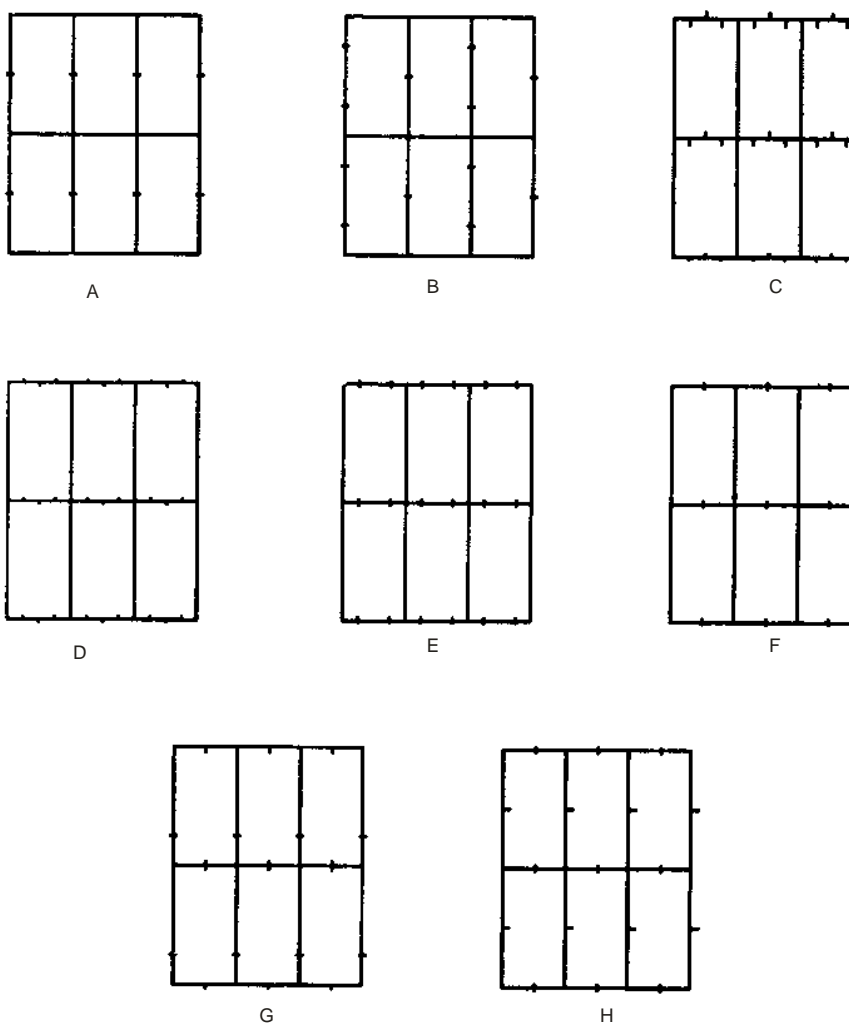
C : Typical Details of Cramps for R.C.C. Backing
